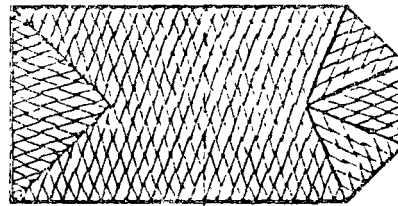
LAMELLA PATTERN AND JOINT DETAIL.
